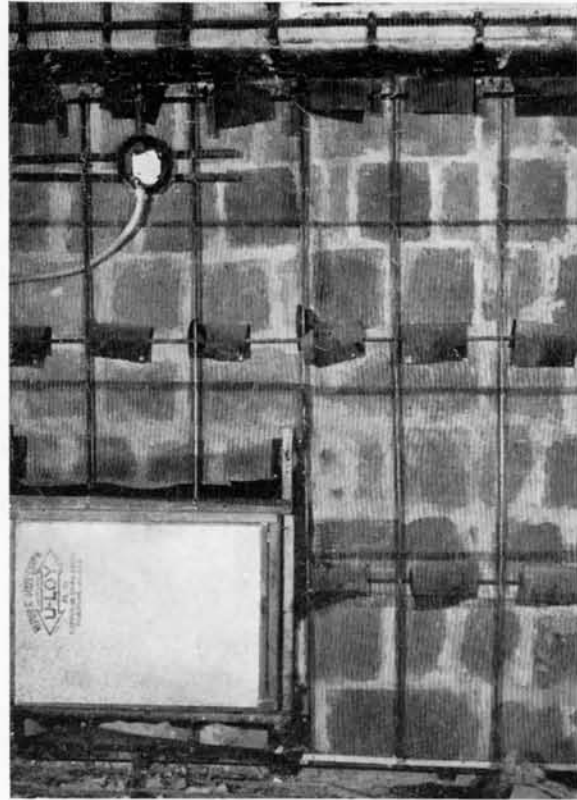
Sound insulated wall construction, showing wall clips holding horizontal furring channels to which vertical channels are wired.
